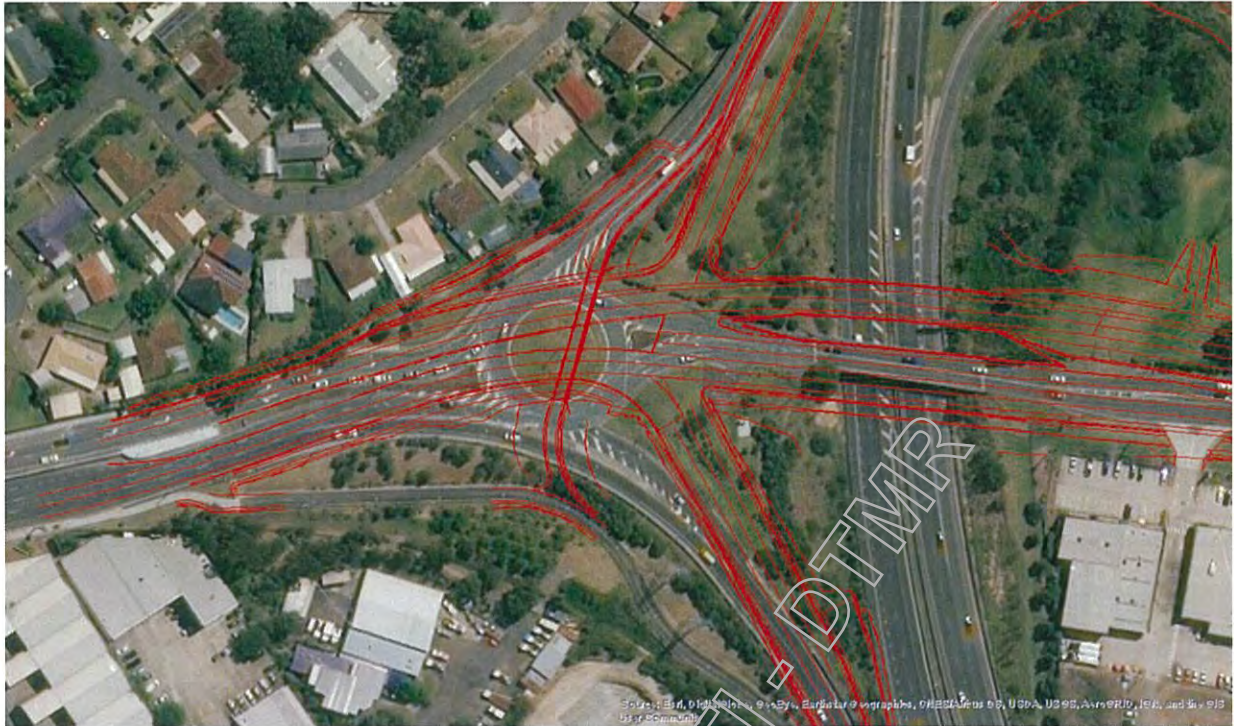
Upgraded Road Network - West Intersection and Cycleway Underpass
